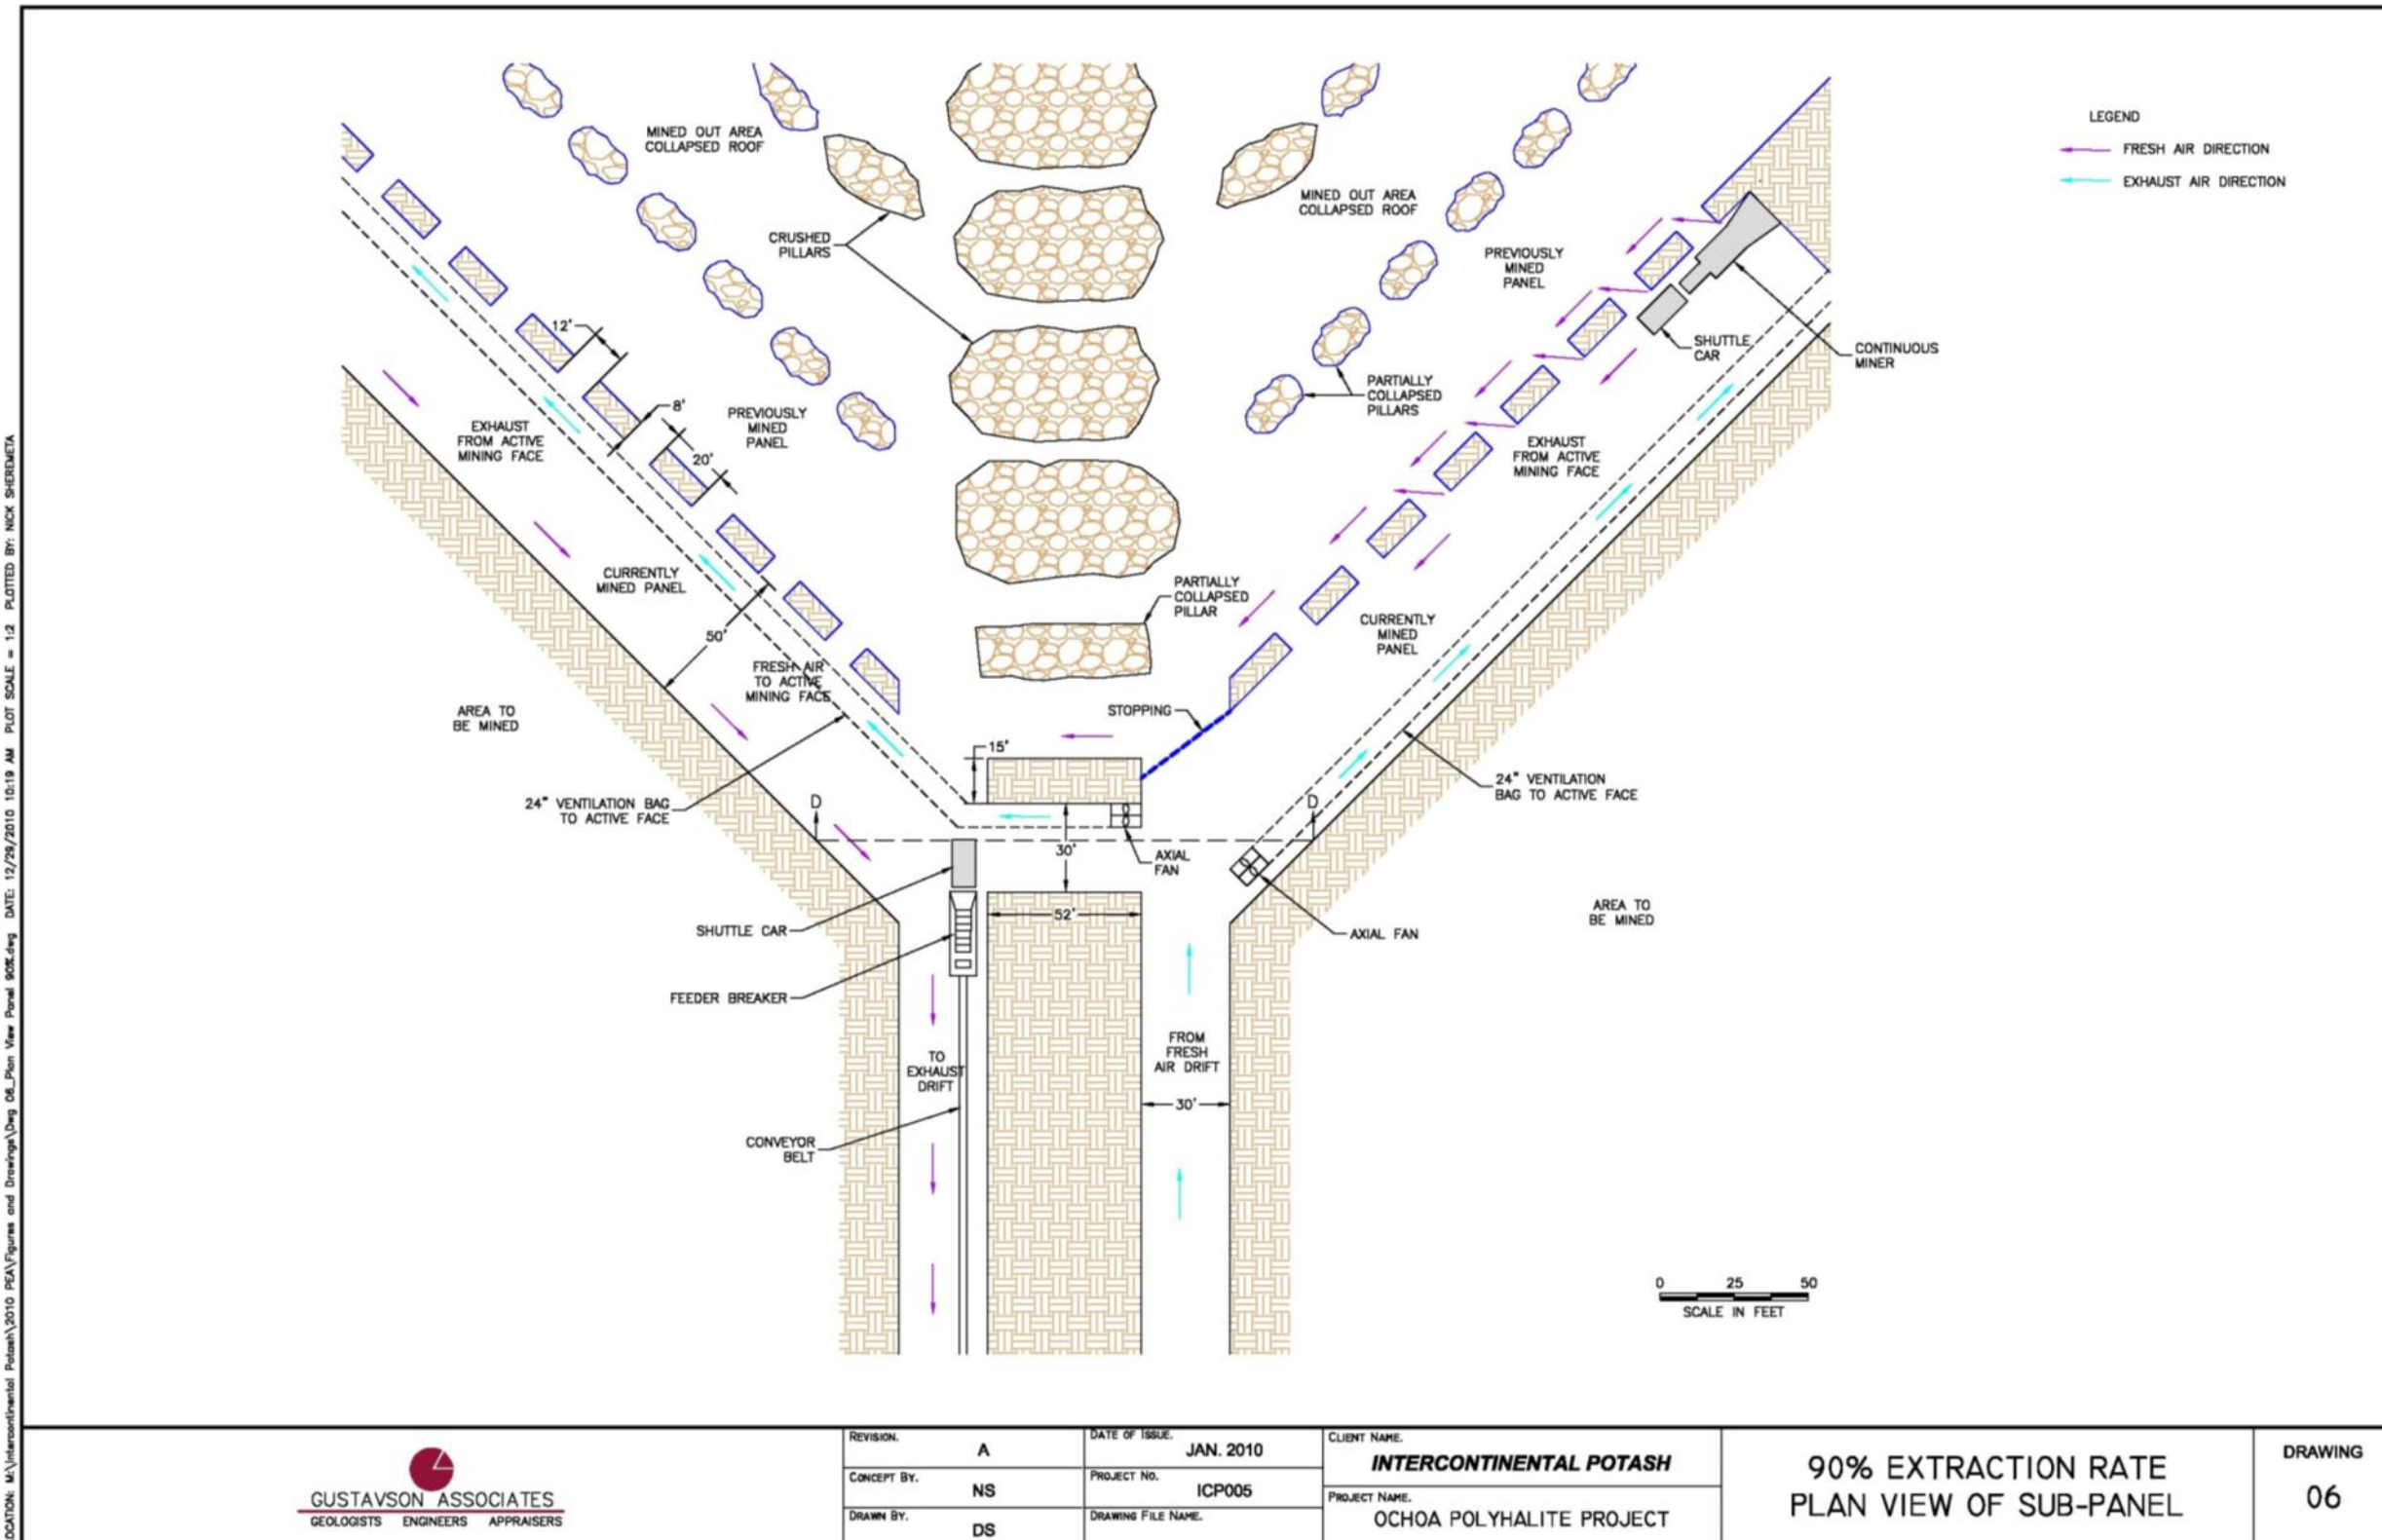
90% EXTRACTION RATE PLAN VIEW OF SUB-PANEL
